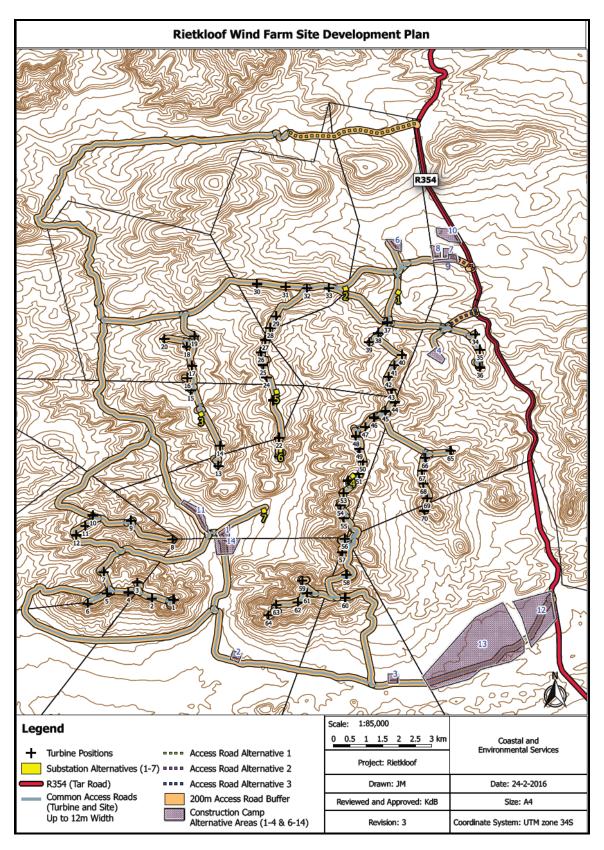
Location of access roads, substations and construction camps associated with Rietkloof WEF
